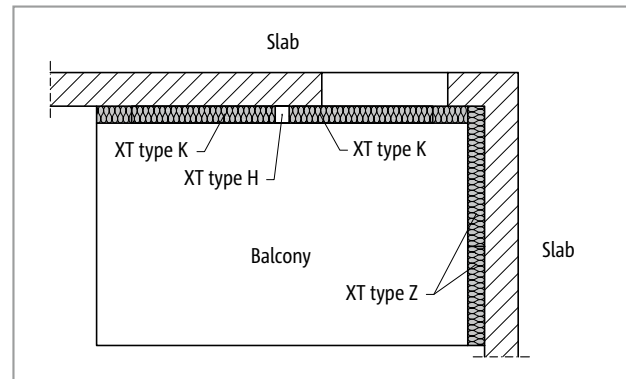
Schöck Isokorb® XT type H: Balcony freely cantilevered
